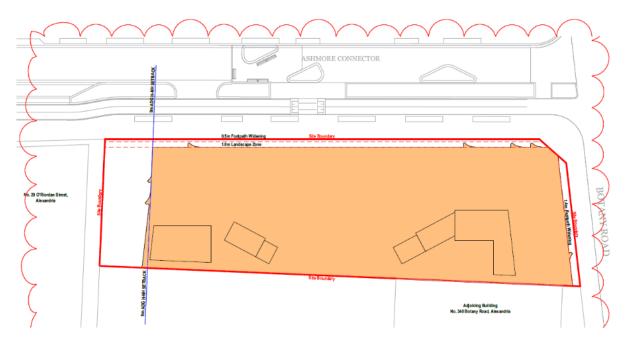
Proposed envelope plan - Level 10 (Note: This plan relates to the additional height within the envelope at the upper extent of Level 9)
